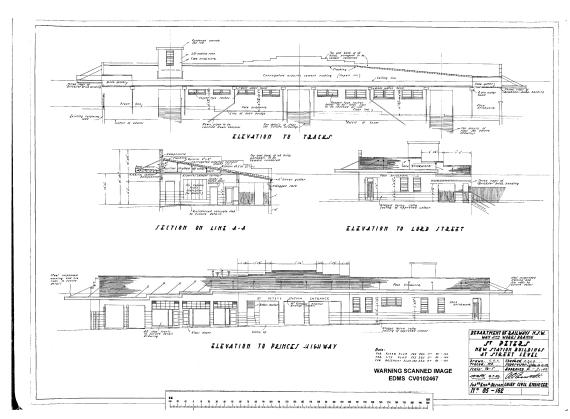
Proposed St Peters New Station Buildings at Street Level. 6 July 1949, which were never built (Transport for NSW EDMS CV0102467)
